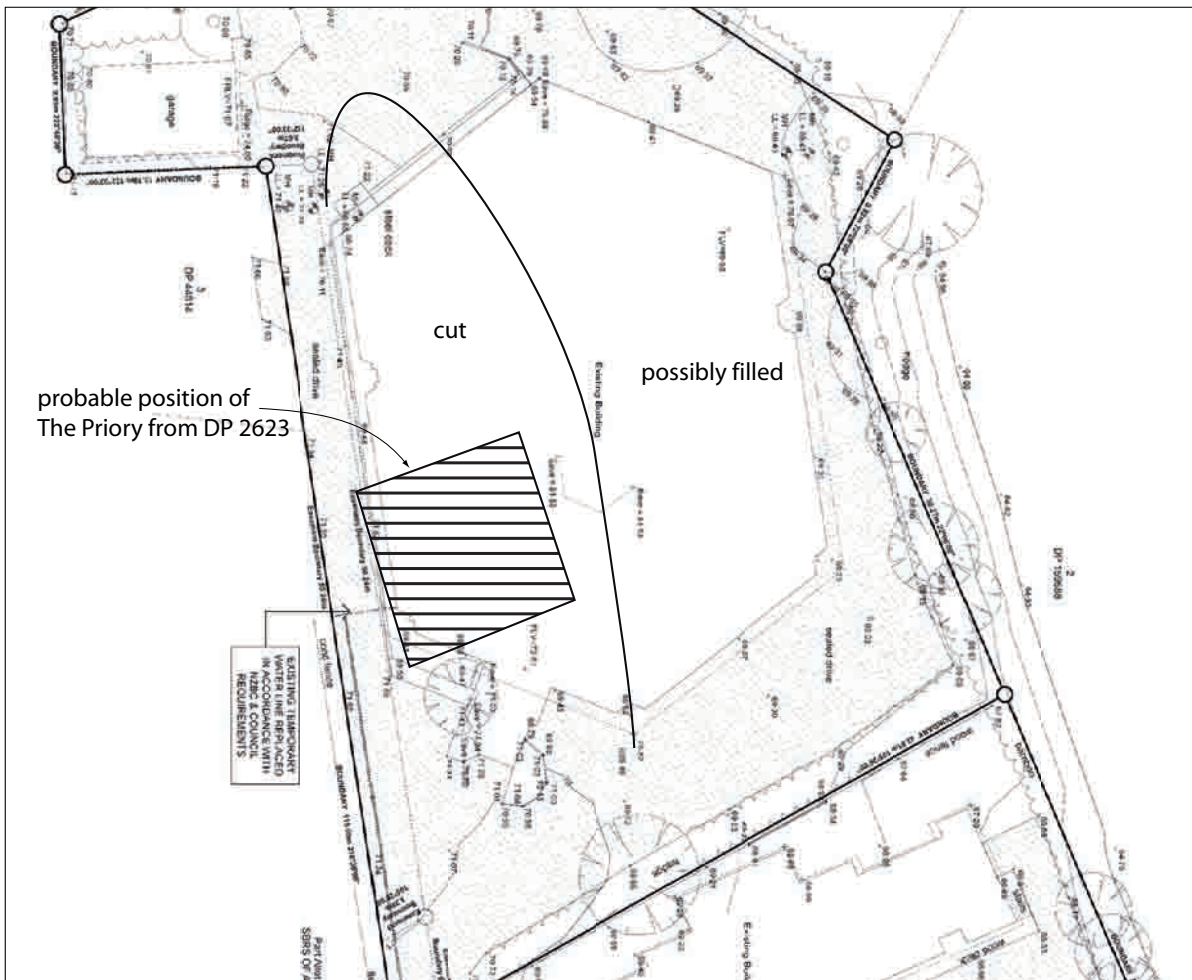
A site plan showing the current building, which can be compared with Figure 4. Areas of cut and possible fill are sketched.
